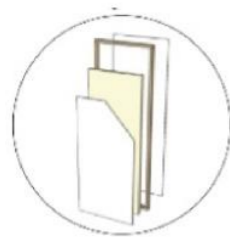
The wooden frame wall with gypsum fiberboard cladding.
